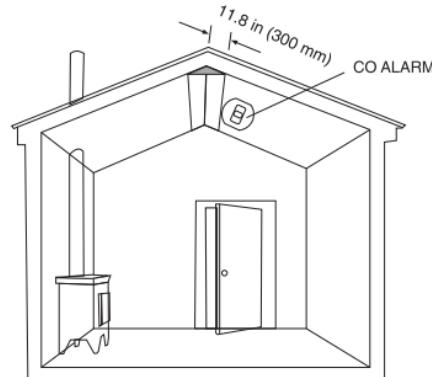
In rooms with sloped ceilings, the CO alarm should be located at the high side of the room
